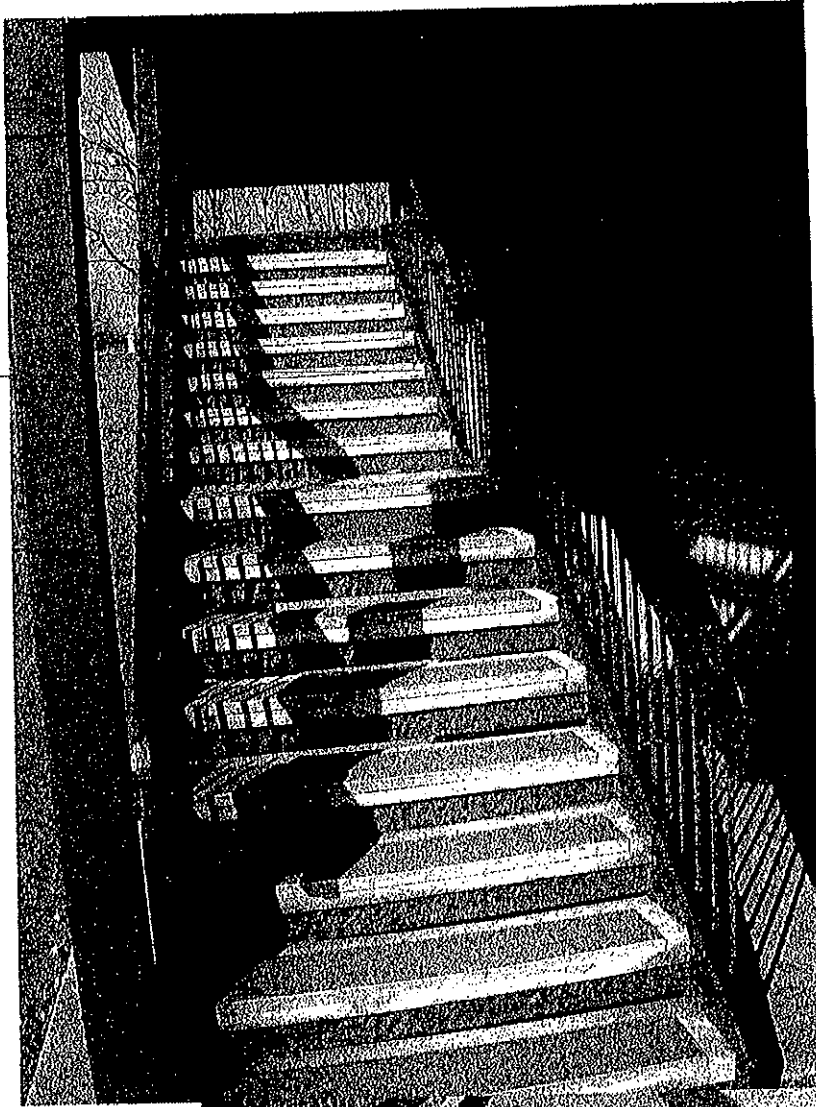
Condition of Steel Framing at Stairs—Some Additional Support Has Been Added to Some of the Stairs
